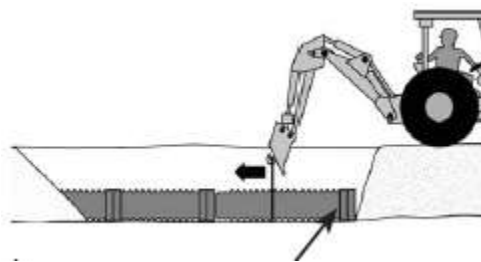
Excavator and Sing Method of Joining Pipe (ADS 2010)
